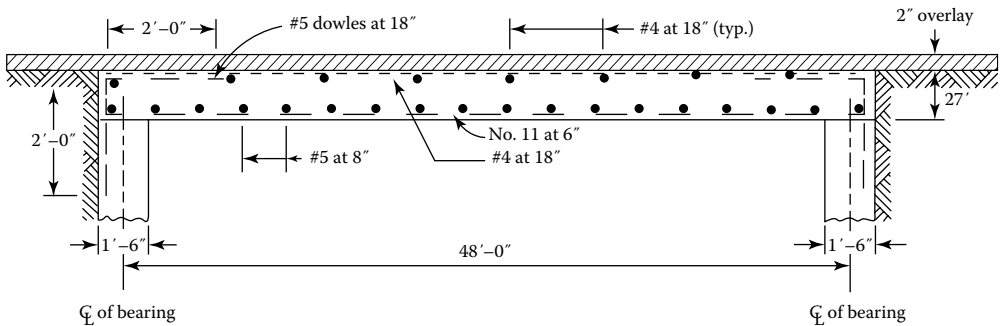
Details of reinforcement for the slab bridge of Example 5.1.
